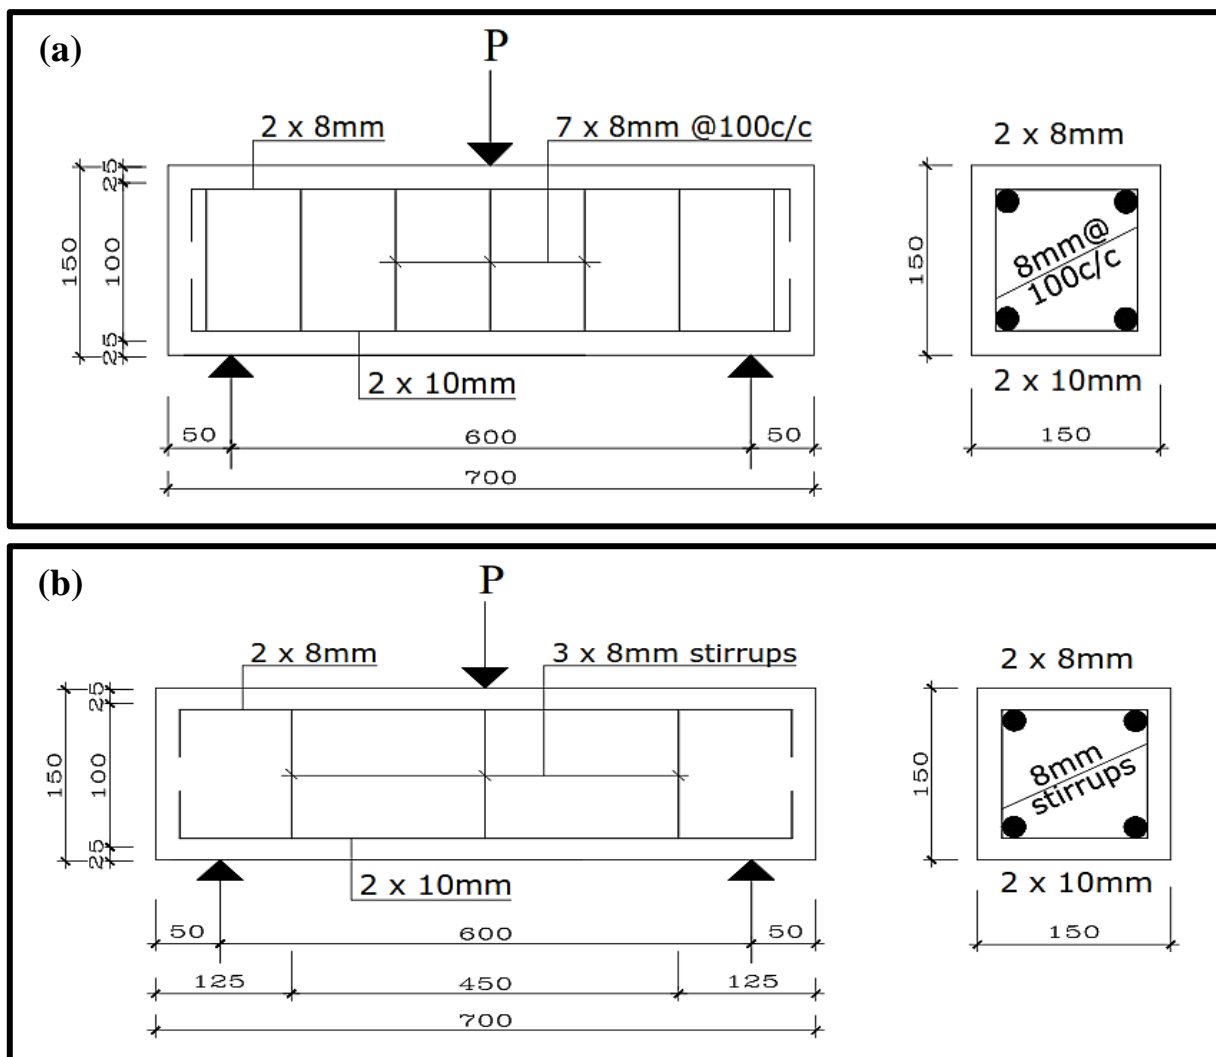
Reinforcement arrangement and beam designs for (a) flexural failure (b) shear failure
